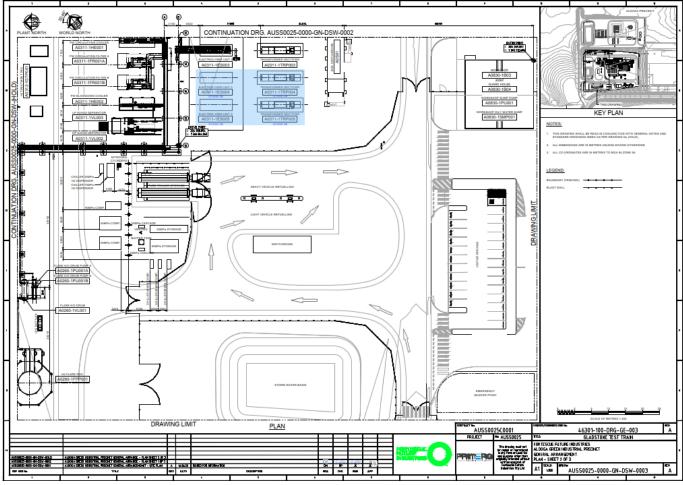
Upper Bench Site Plan (West) Source: Primero
